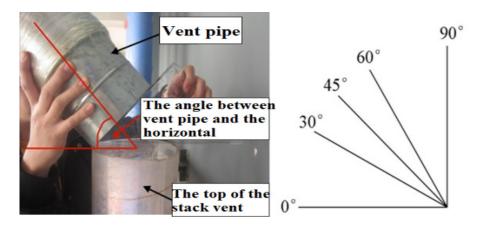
Connection method of vent pipe and the vertical drainage pipe
